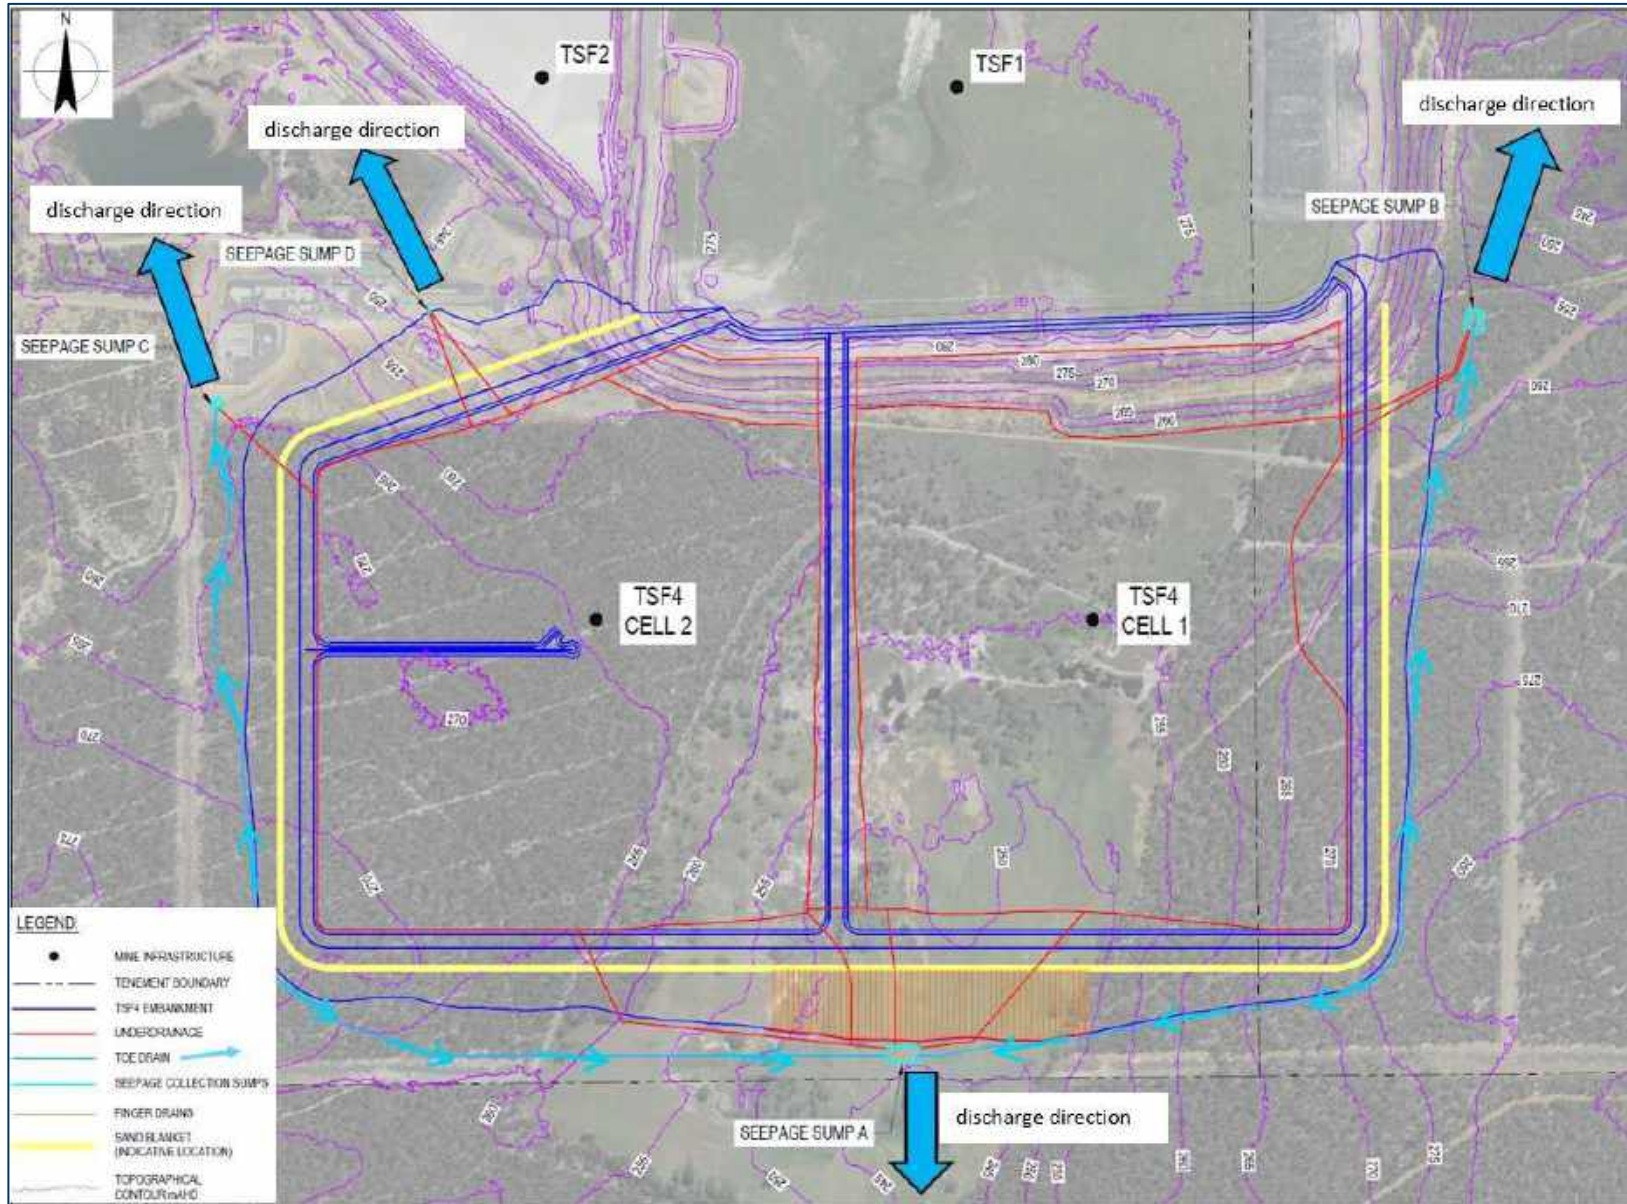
TSF4 Layout Indicating Internal and External Drainage
